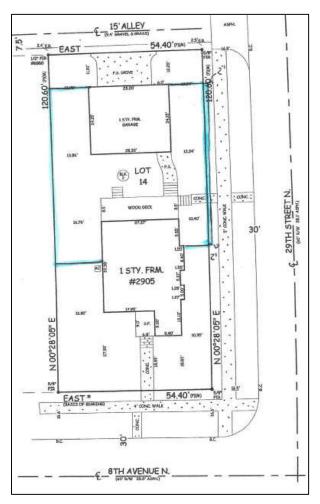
Site plan of proposed fence (shown in blue) provided in application.
